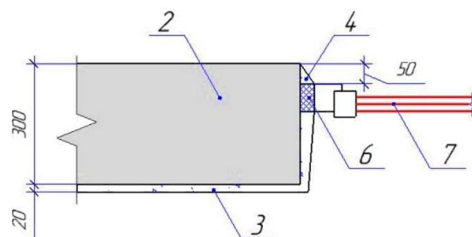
The junction of the metal-plastic window to the precast concrete wall
